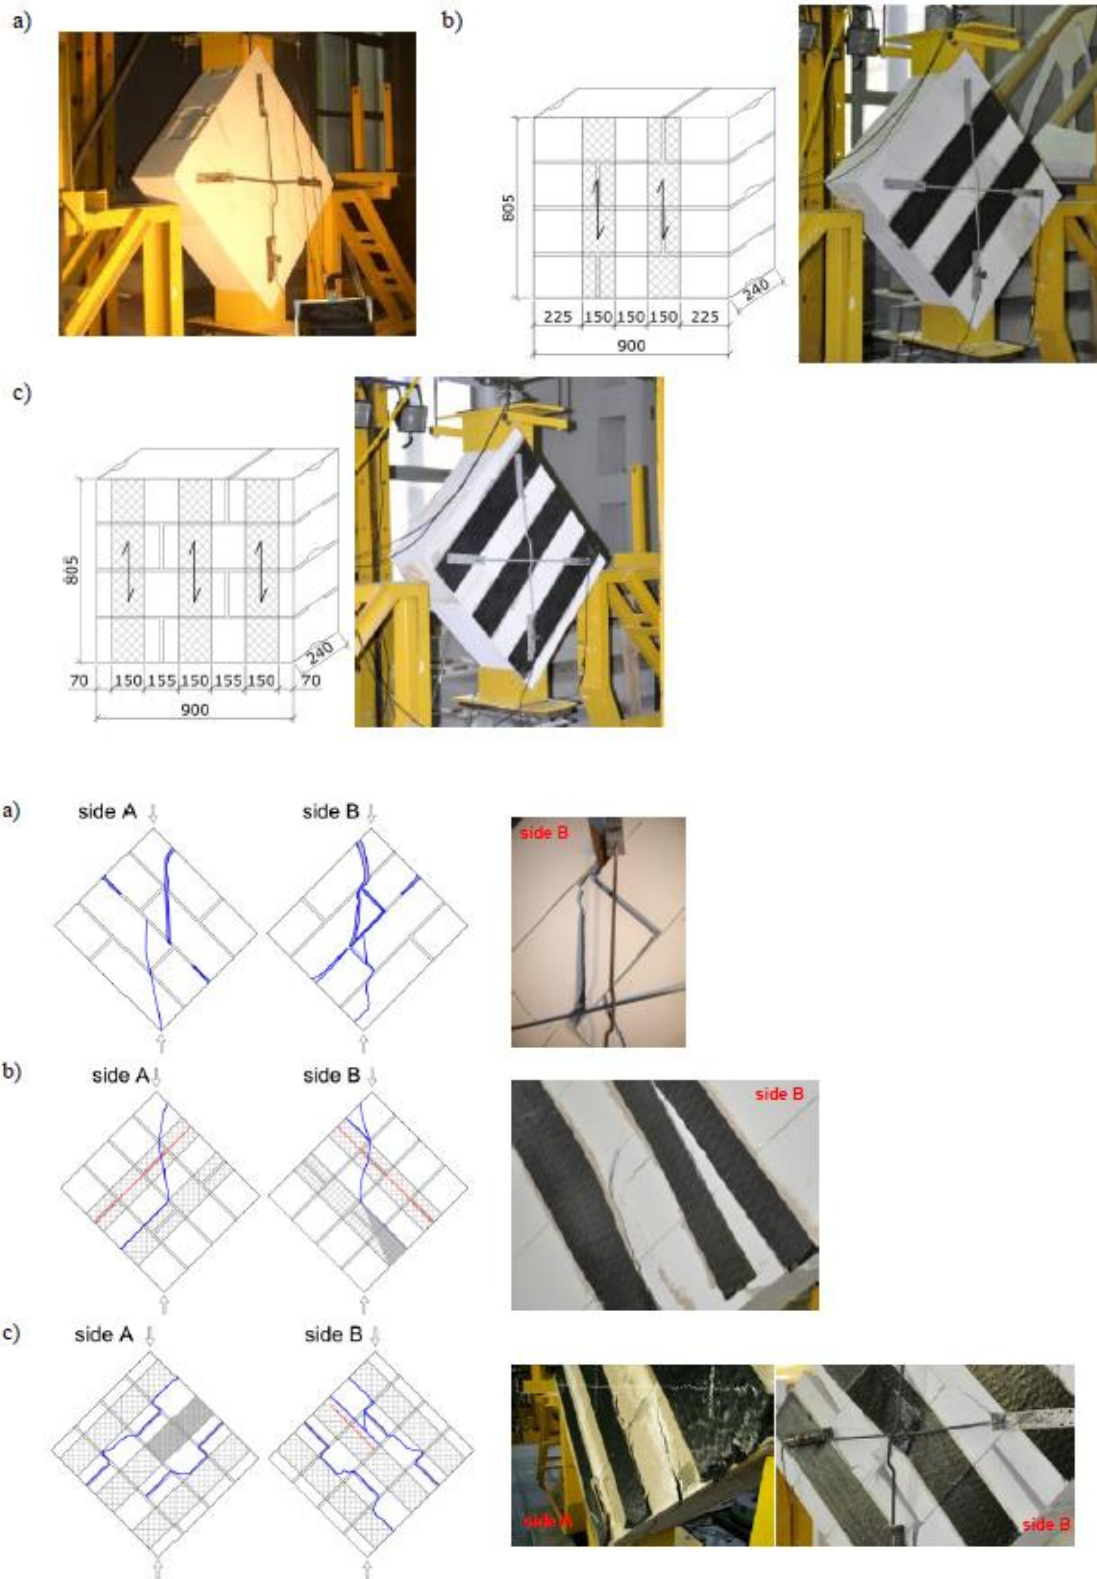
Typical modes of failure for specimens: a) a)NS-3 ;b)IIc-5;c)IIIc-5 [55]
